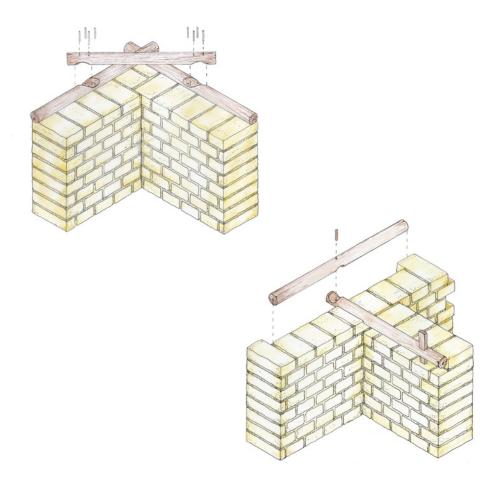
Application of timber keys or connections to strengthen wall corners. Source: Alessandra Sprega for the J. Paul Getty Trust.
